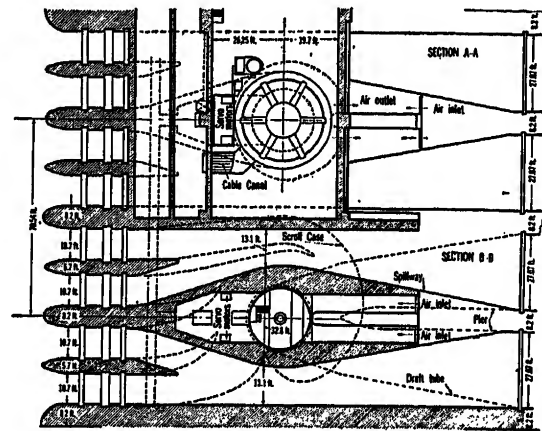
KEMBS POWER PLANT. PLAN OF POWER HOUSE
